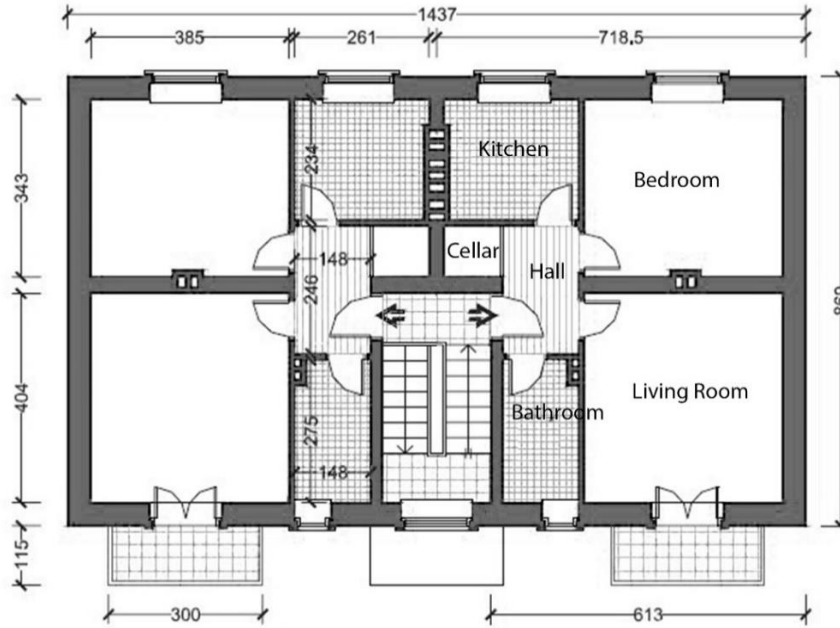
18. Type 4 Floor Plan (Redrawn with additional information by Merve Köz, original plans from Asiliskender, 2002, p. 87).
